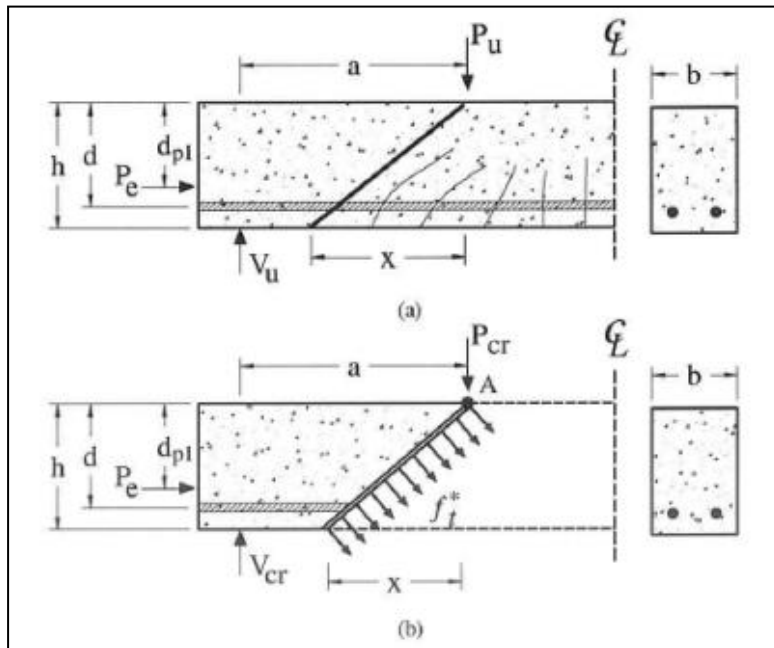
Critical diagonal crack of S.S. beam (a) yield line and (b) cracking load
